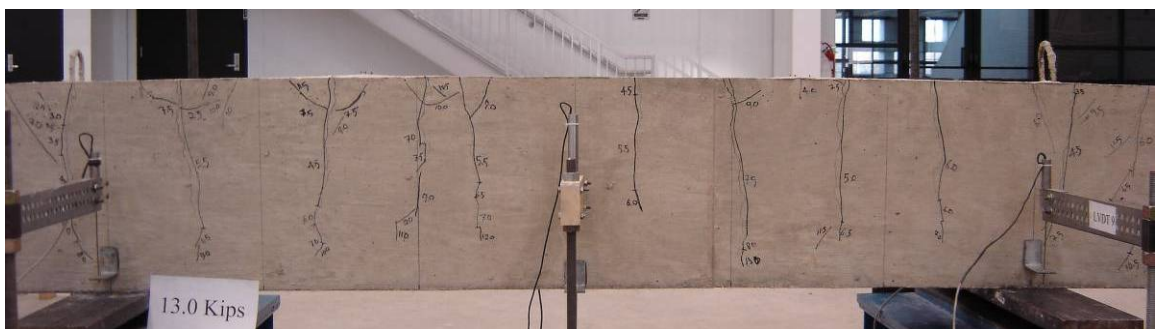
Cracking Pattern of Glass FRP Reinforced Specimen Prior to Failure (Specimen B-HG1-5-24)
